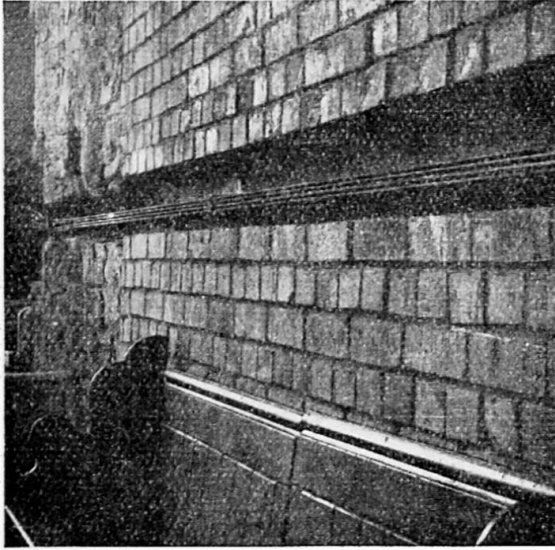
Chase in the inner wall, where the opening had been bricked up.
